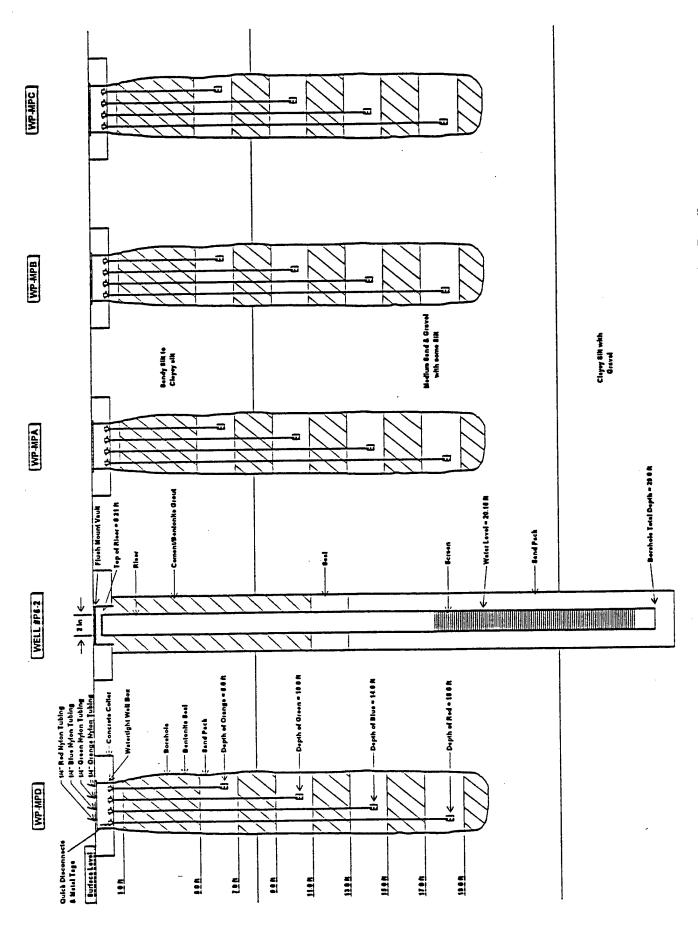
Bioslurper Short-Term Pilot Test Monitoring Point Installation Detail
